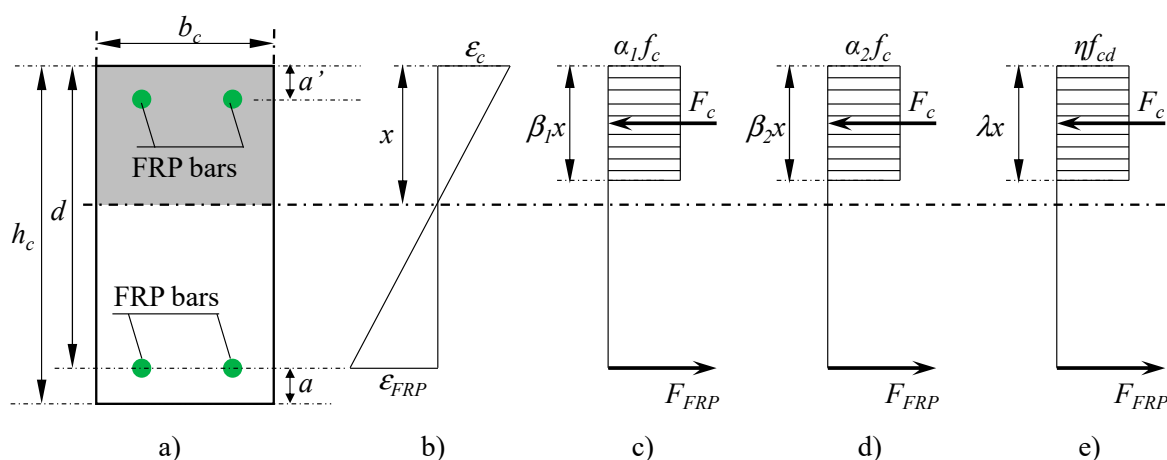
Distribution of strain and stress of rectangular sections: (a) section dimension; (b) strain distribution; (c) stress and forces of the section (ACI 440.1R); (d) stress and forces of the section (CSA S806); (e) stress and forces of the section (CEB-FIB).
